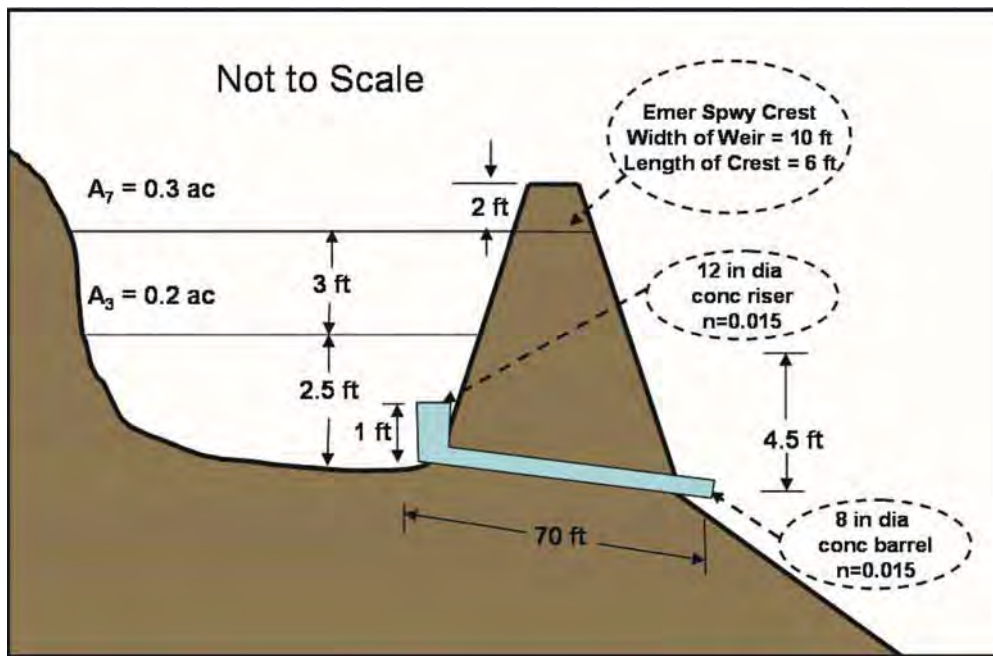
Schematic of Stormwater Retention Pond for Example Problem 3-3
